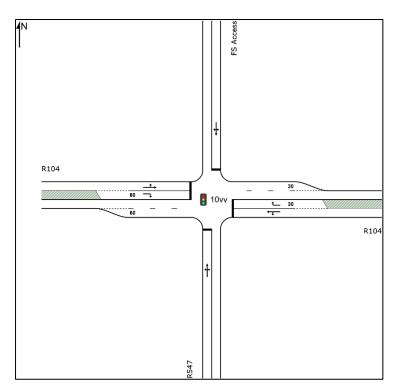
Intersection 10 Proposed Layout (Background Traffic)
